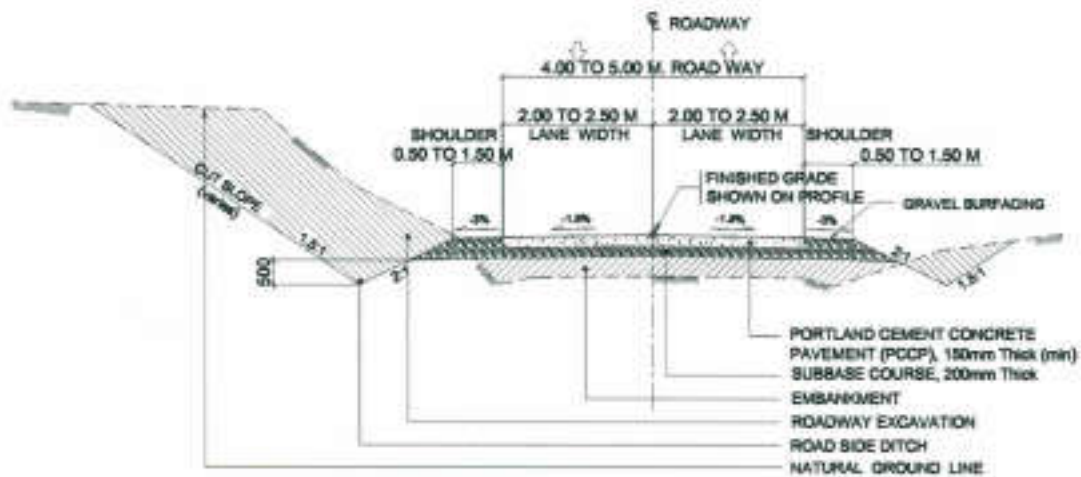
TYPICAL ROADWAY CROSS-SECTION FOR EXISTING ROADS
